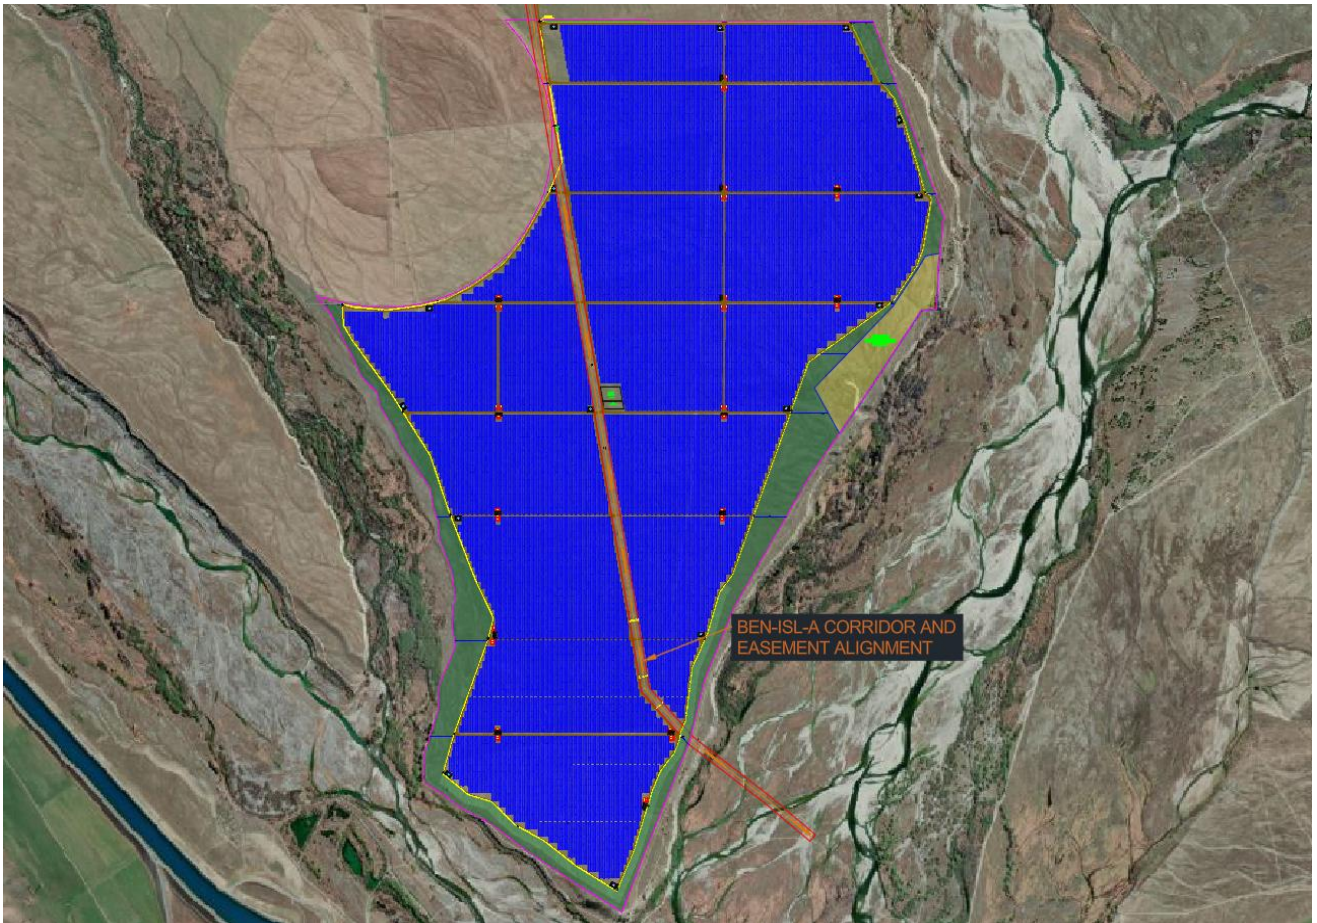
Site Layout Plan showing BEN-ISL-A corridor and easement alignment.
